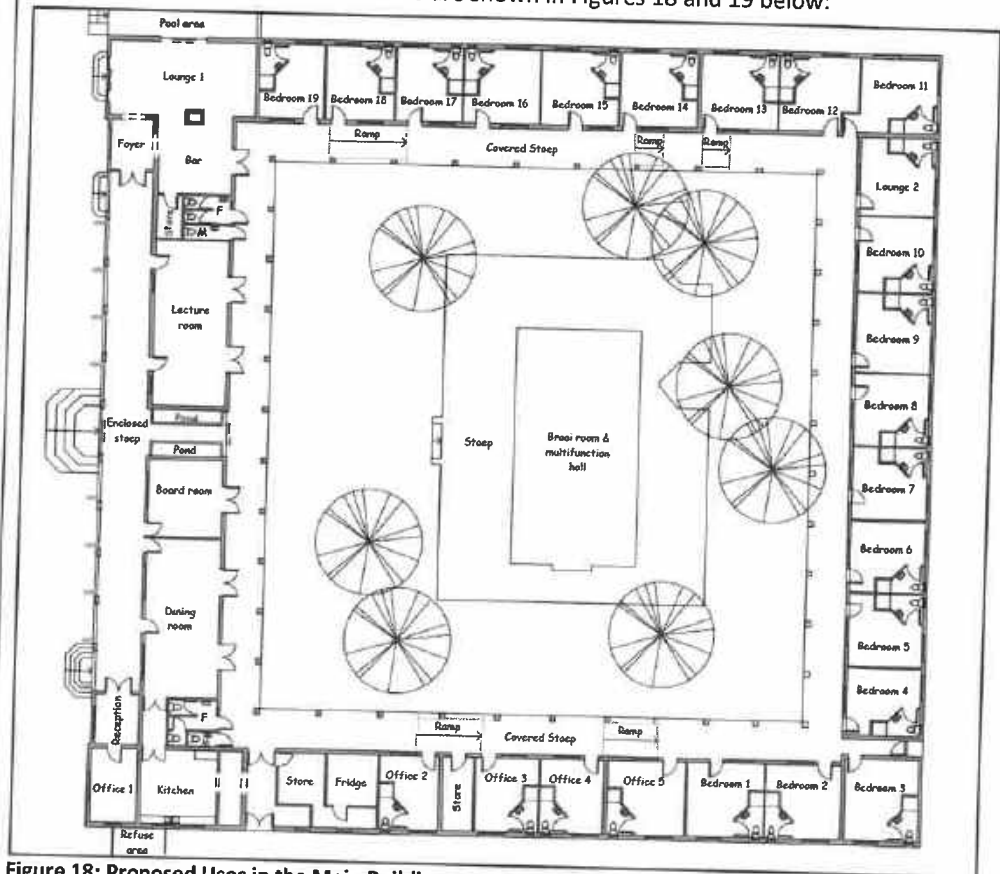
Proposed Uses in the Main Building potentially subject to some internal changes
